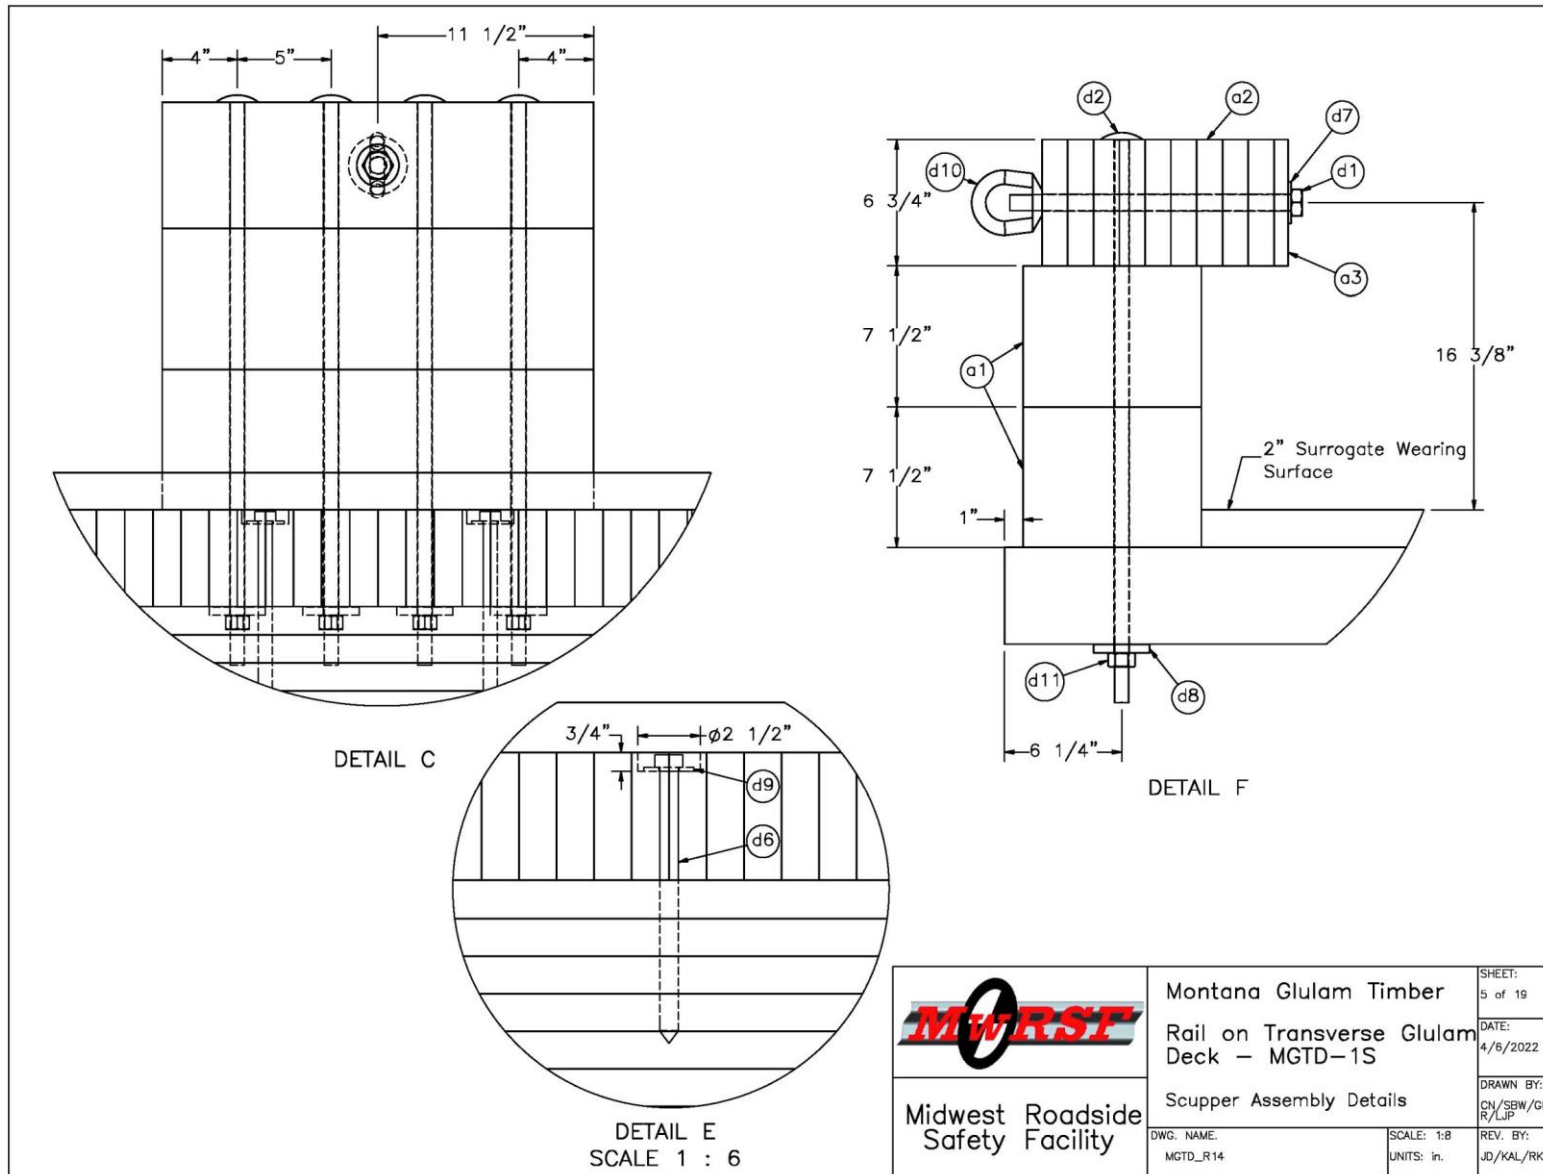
Scupper Assembly Details, Test No. MGTD-1S
